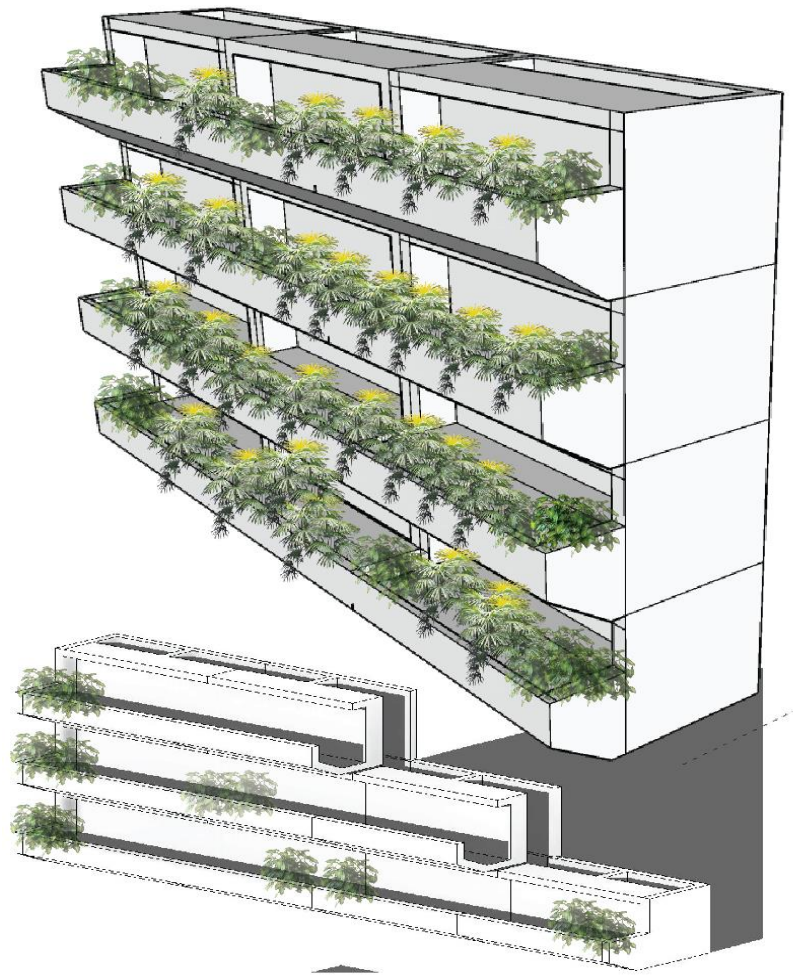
Wall made up of Living block prototype “B”, (Source: Author)
